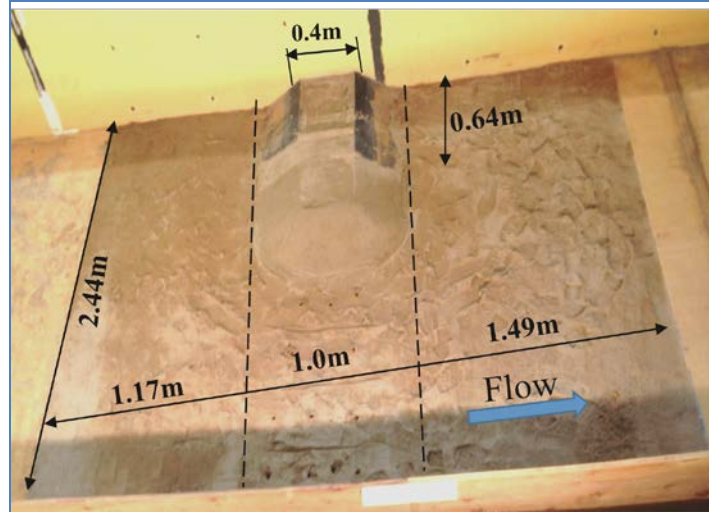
The 1:30-scale earthen embankment for a spill-through abutment located on the sediment recess in a pre-run condition
